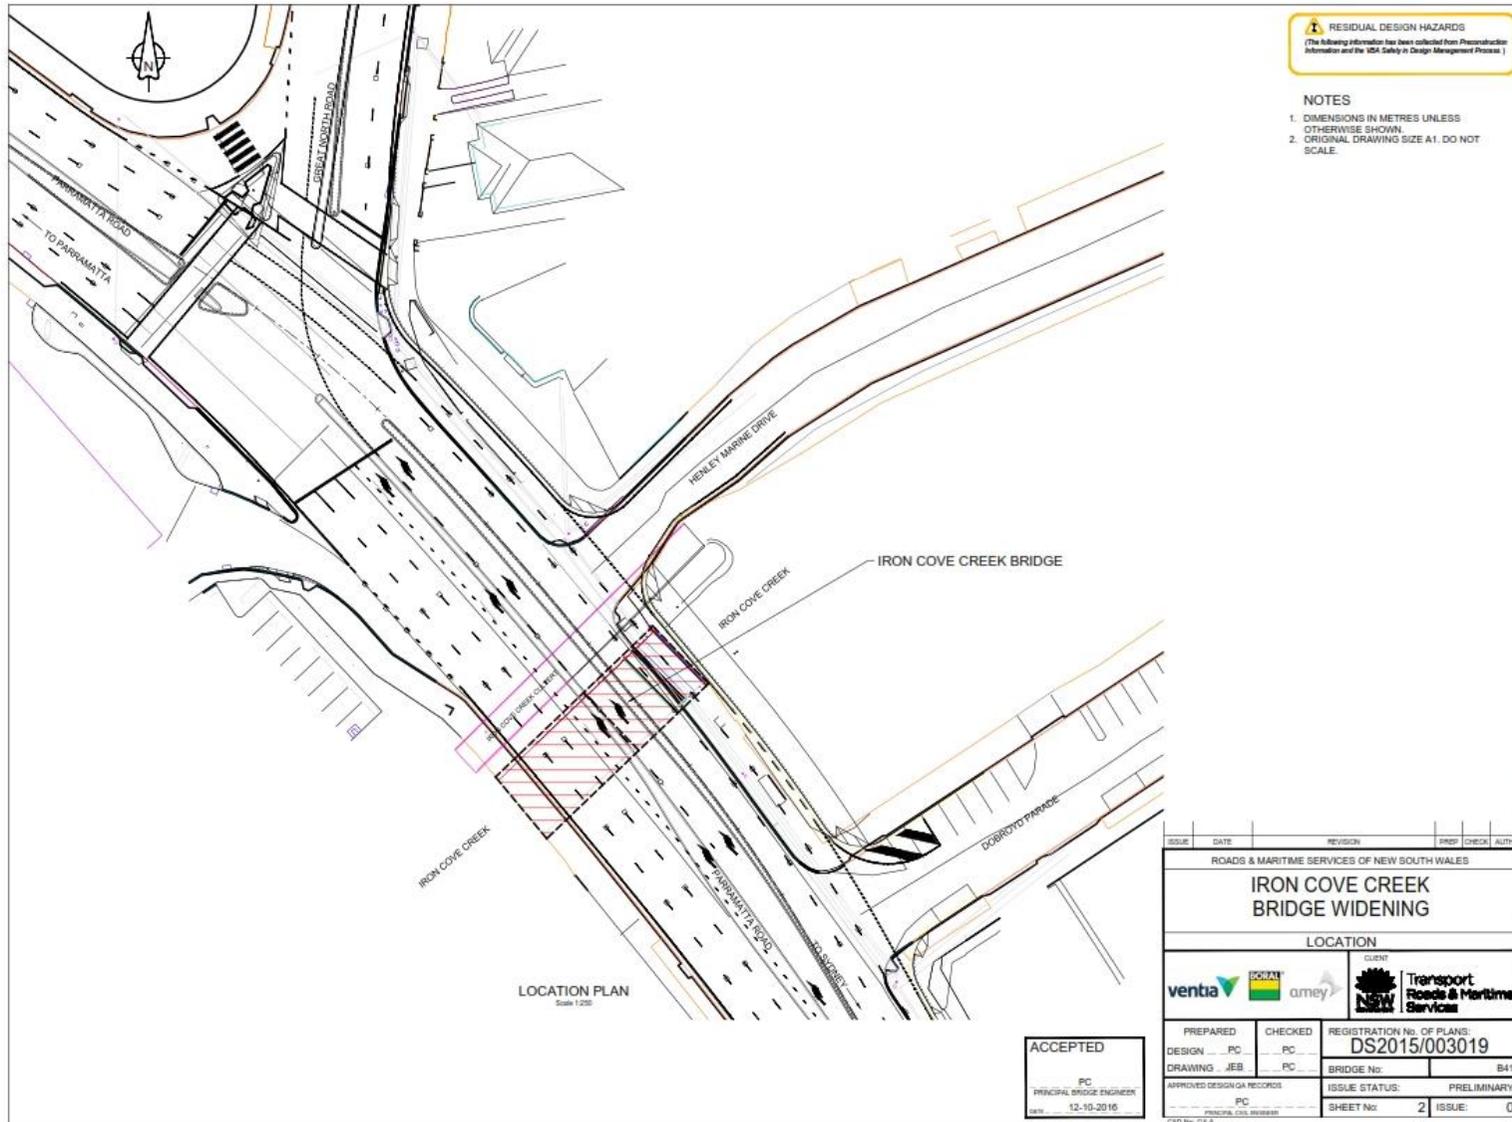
Proposed plan of widening to bridge deck (Source: VBA-JV)
